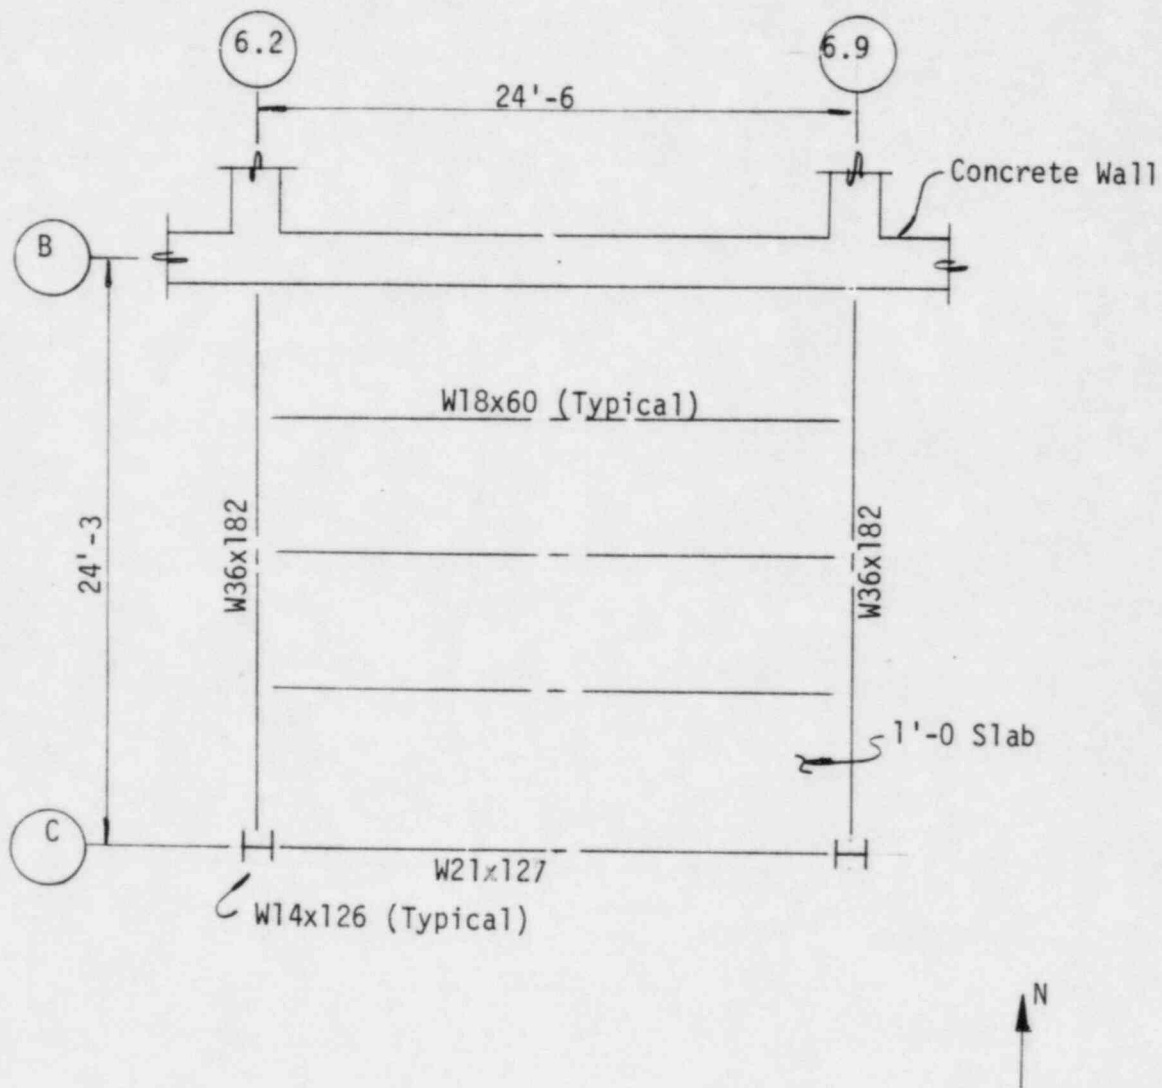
AUXILIARY BUILDING FLOOR AT ELEVATION 614'-0
